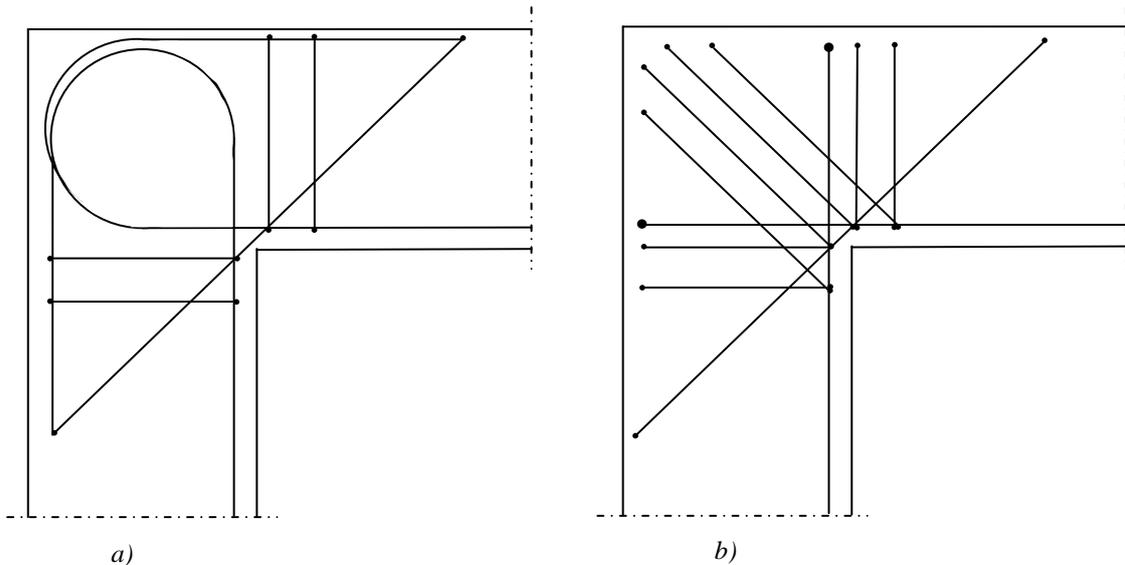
Frame corner with large opening moment. a) and b) show alternative arrangement of reinforcement. The figure is based on SIS (2008).
